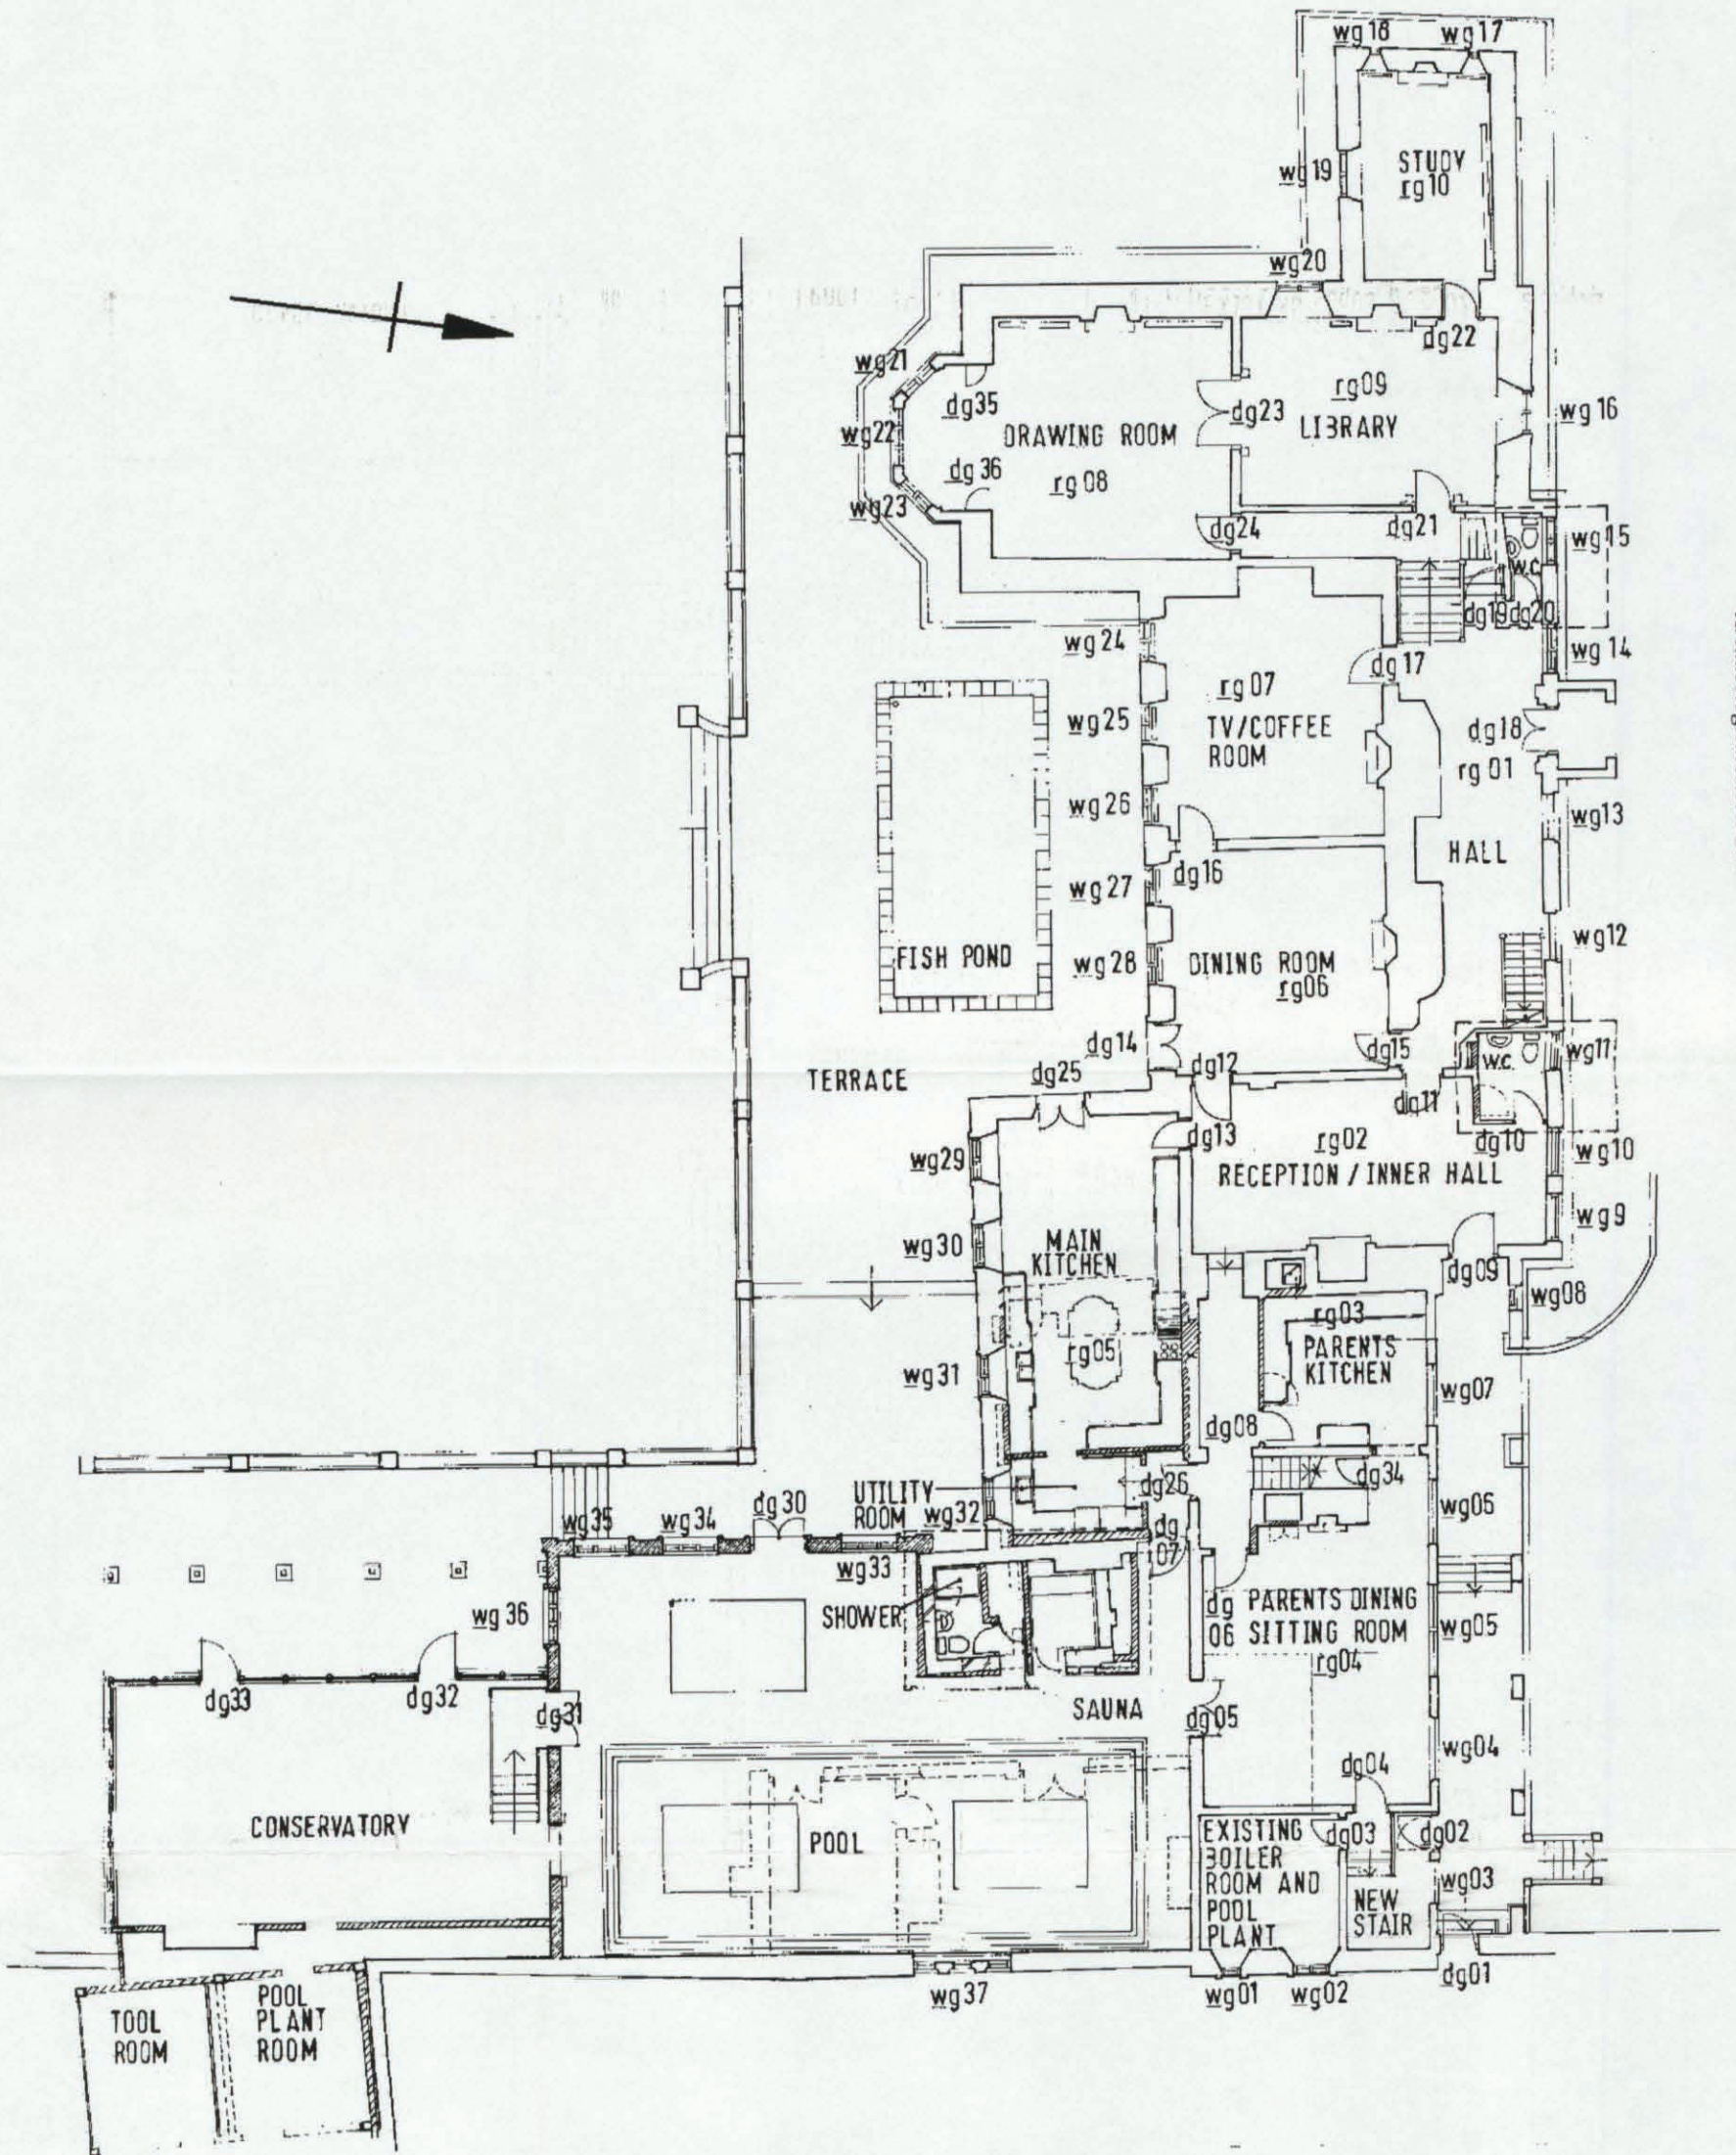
Ground floor plan of Dinton Hall (scale 1:200)
